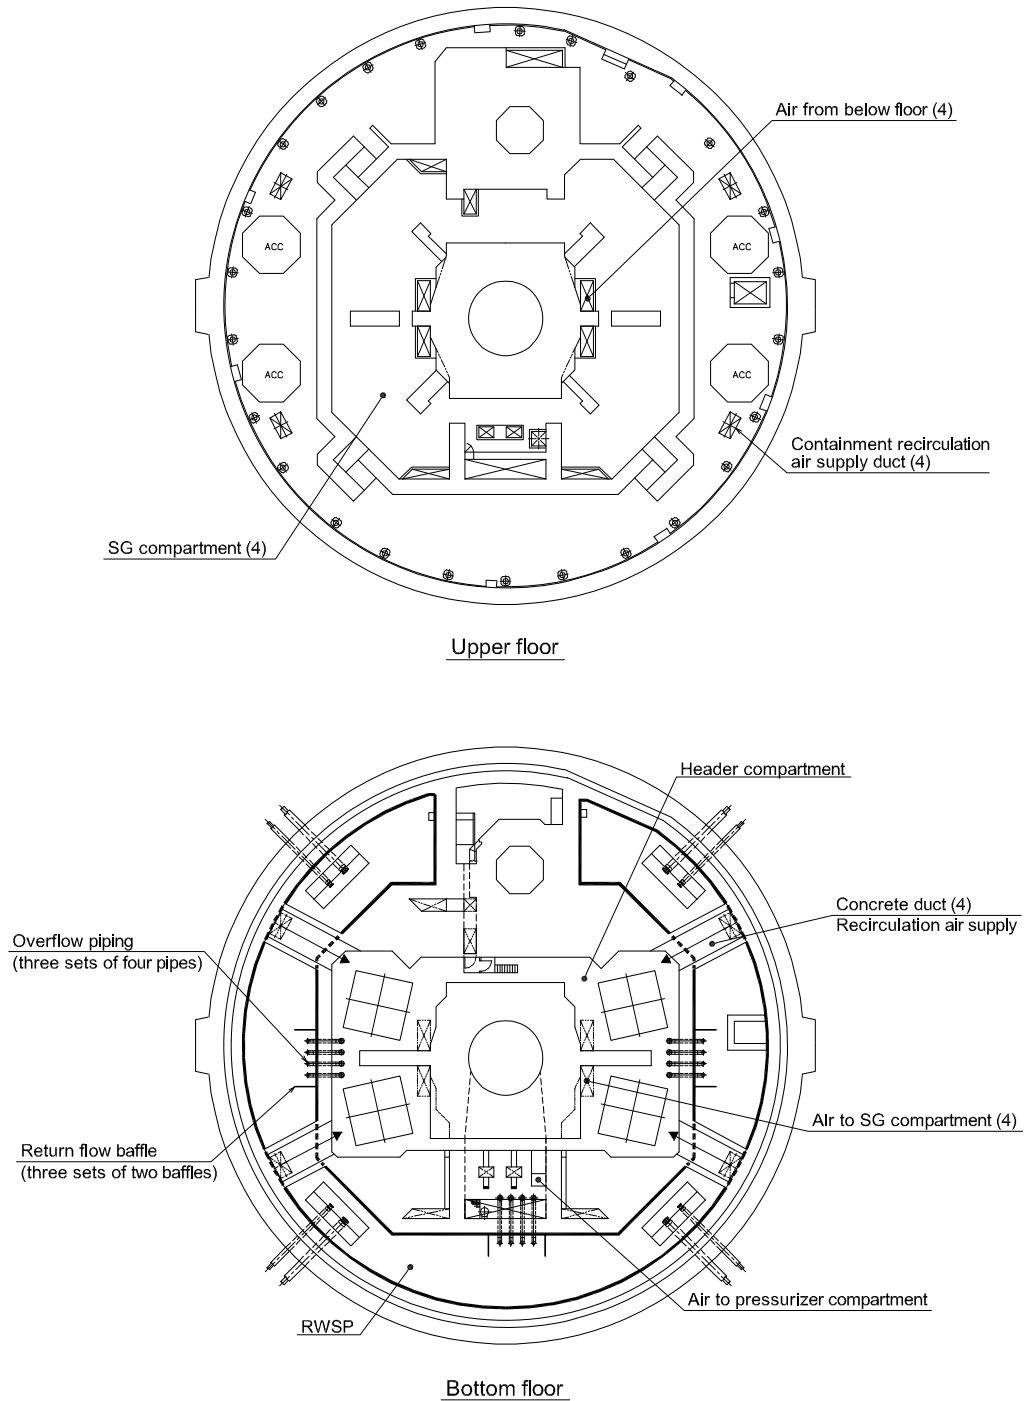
RWSP Upper and Lower Plan View at Elevation 25 ft.- 3 in.
